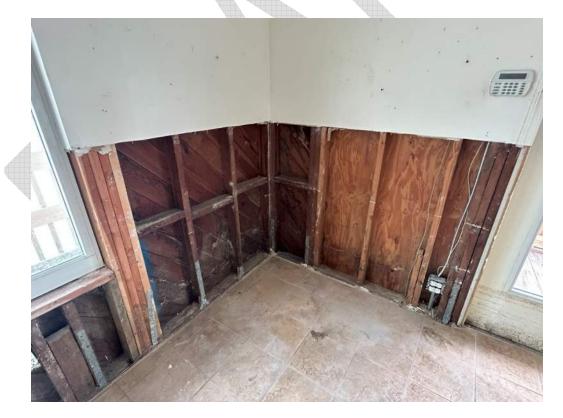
View of the Exterior Walls Wood Frame Structure.
